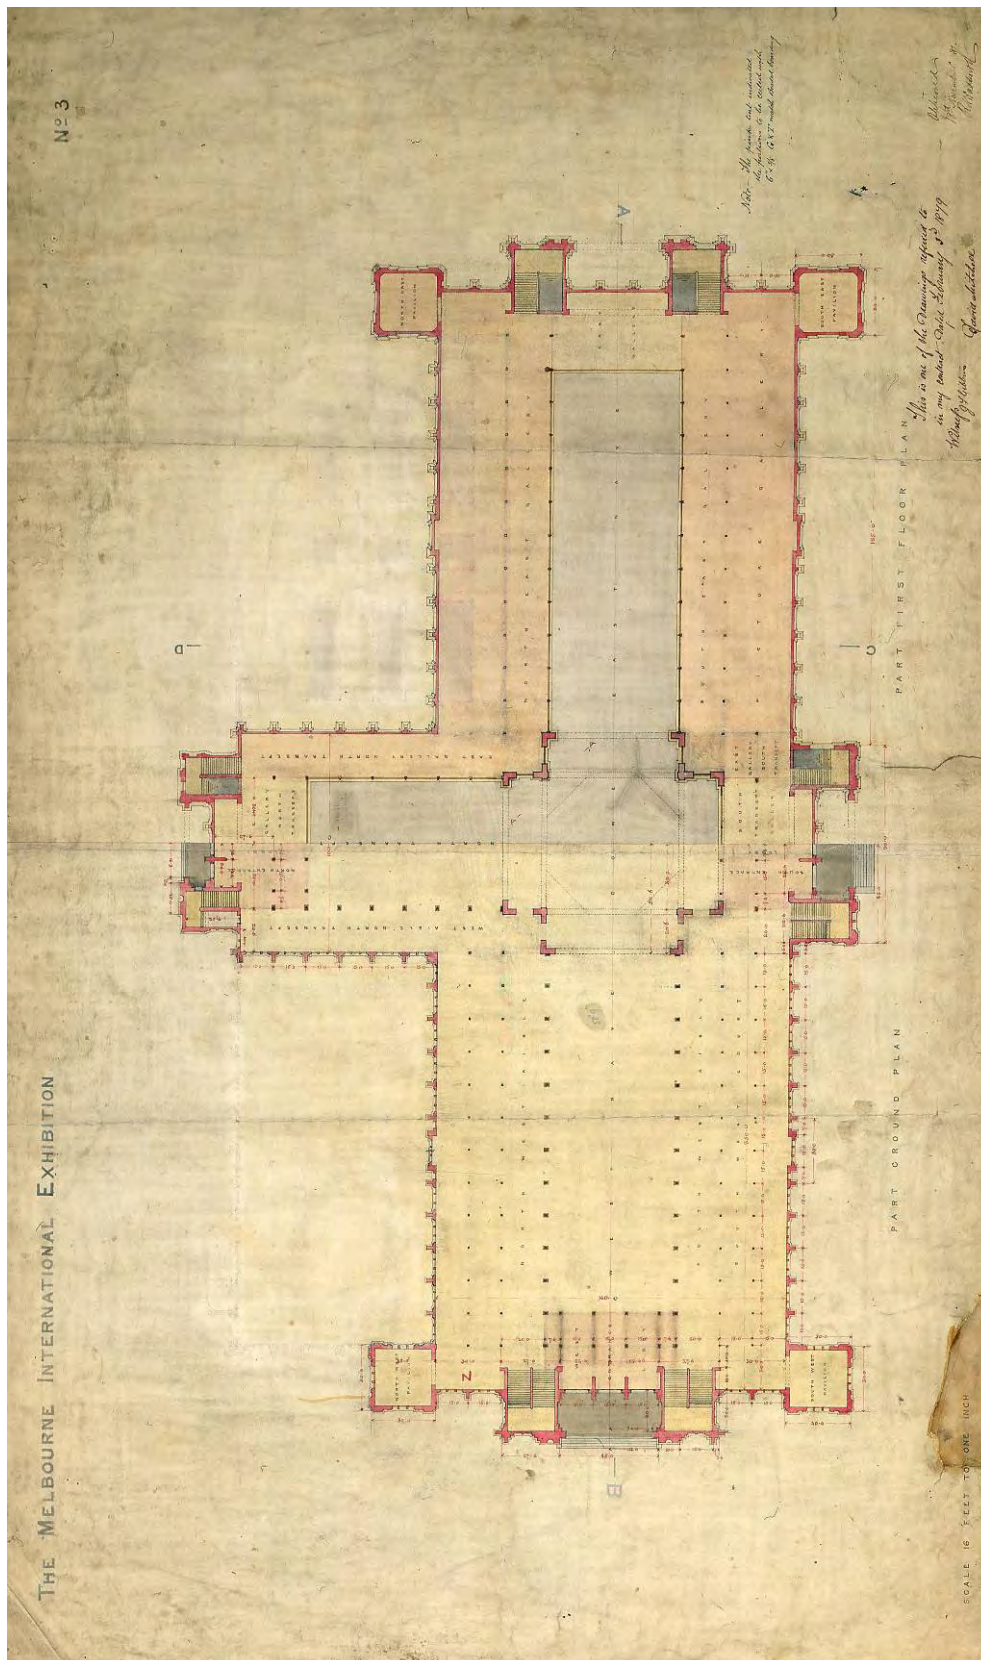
The Melbourne International Exhibition, part ground plan and part first floor plan, 1879.
